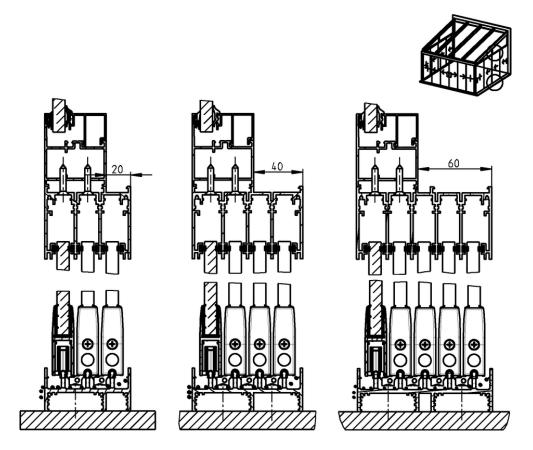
Assembly of the 3- to 5-track guide profiles below the roof support
